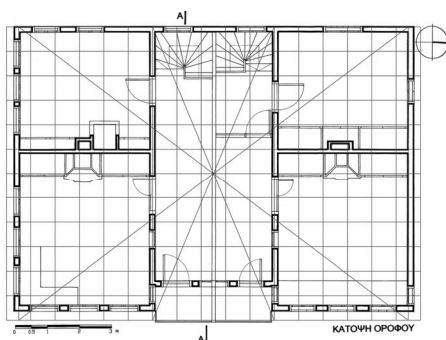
Upper storey plan of Fouzas Mansion in Florina
